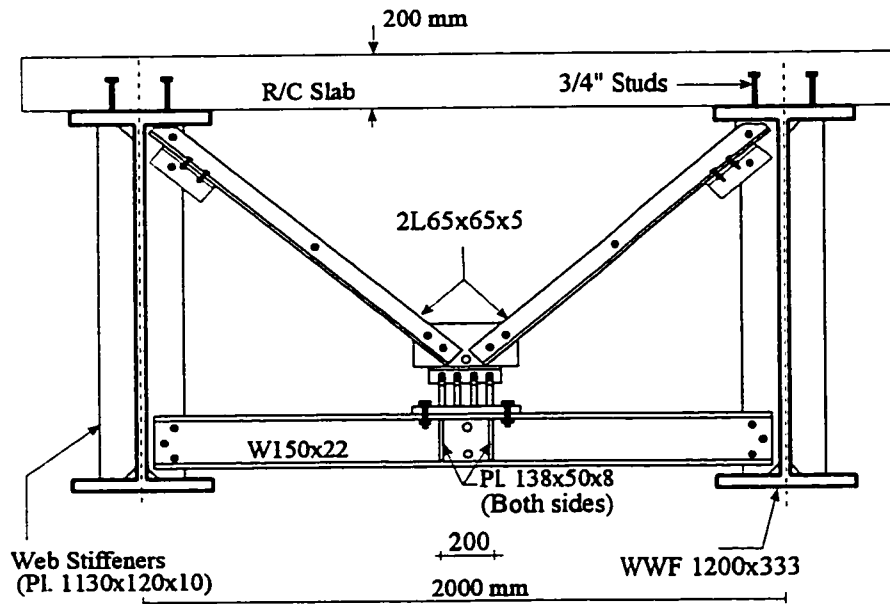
Elevation of ductile end-diaphragm specimen having TADAS.
